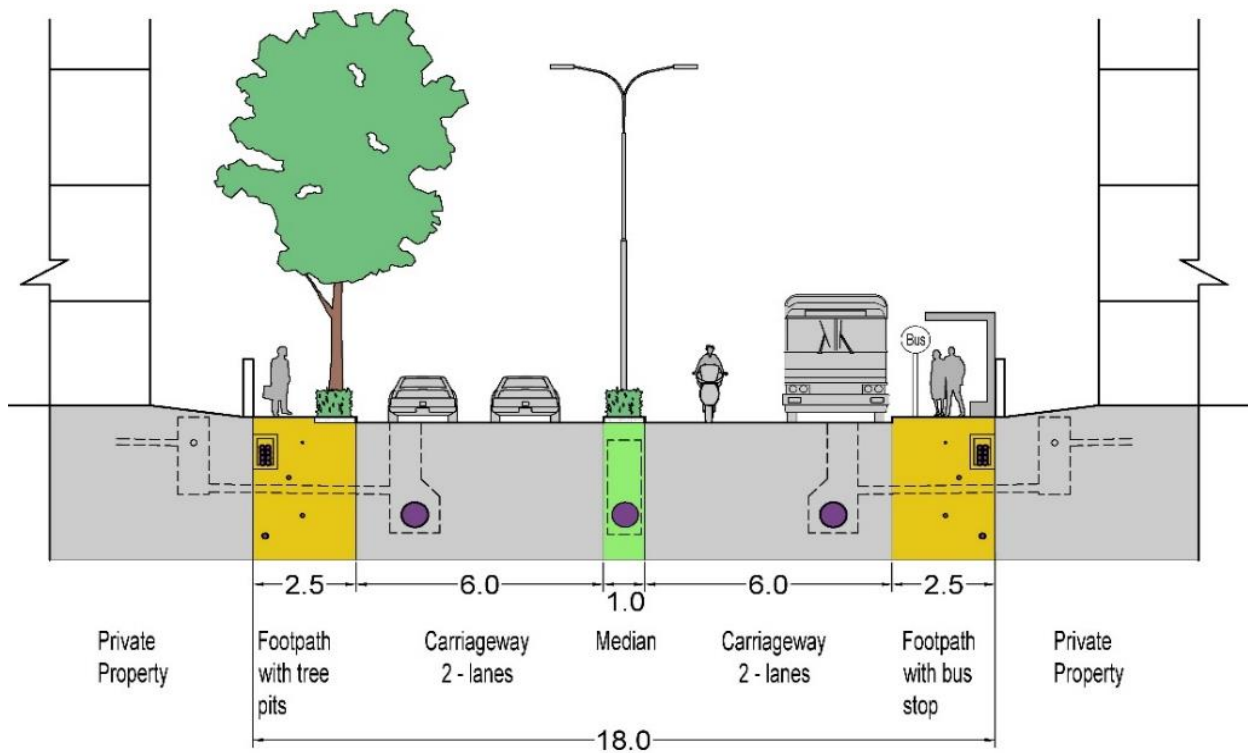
TYPICAL SECTION OF 18M WIDE ROAD
